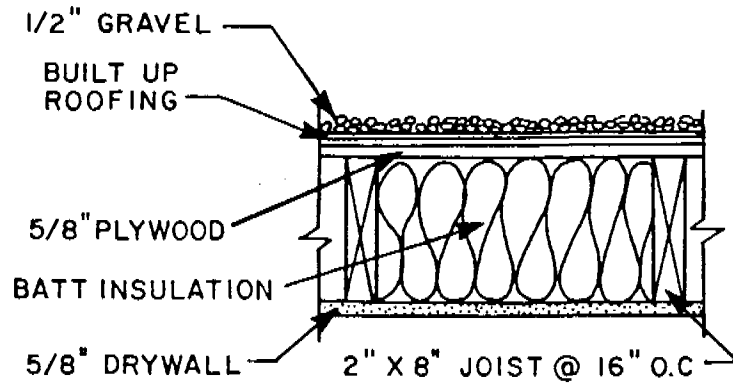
Wood-Frame Roof for Residential Building⁽³⁾
